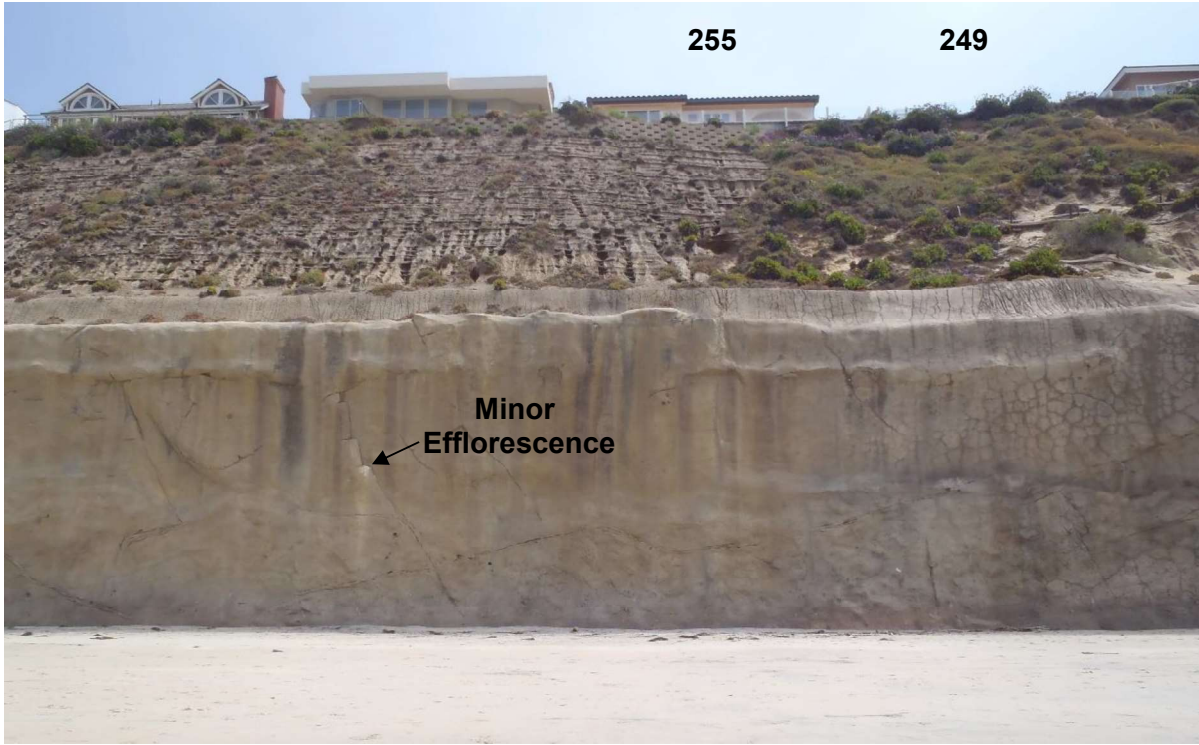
Seawall below 265 to 249 Pacific Avenue (April 26, 2023).
